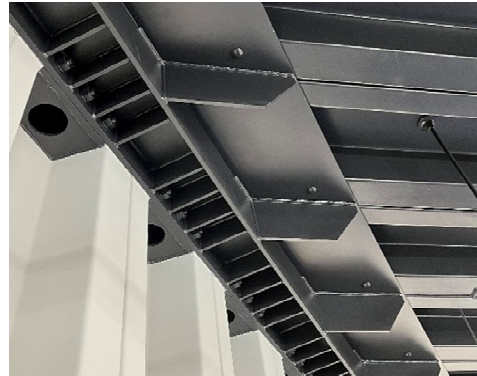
Type 2 (Fig. 12) a view looking up at the second floor ceiling
